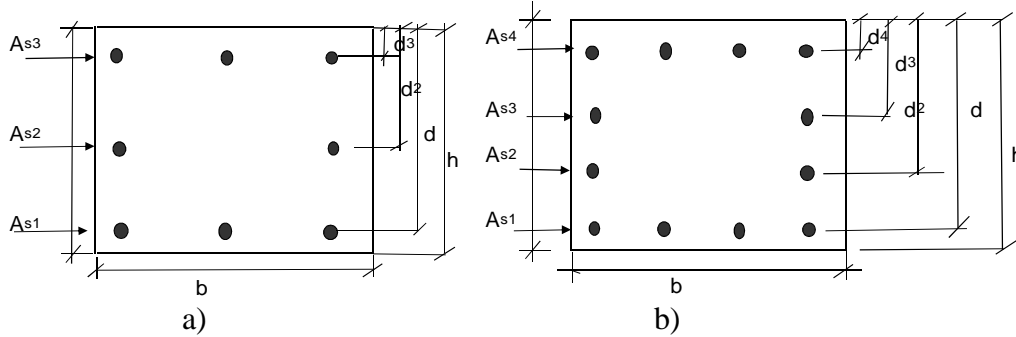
Designed column sections and longitudinal reinforcement distributions
